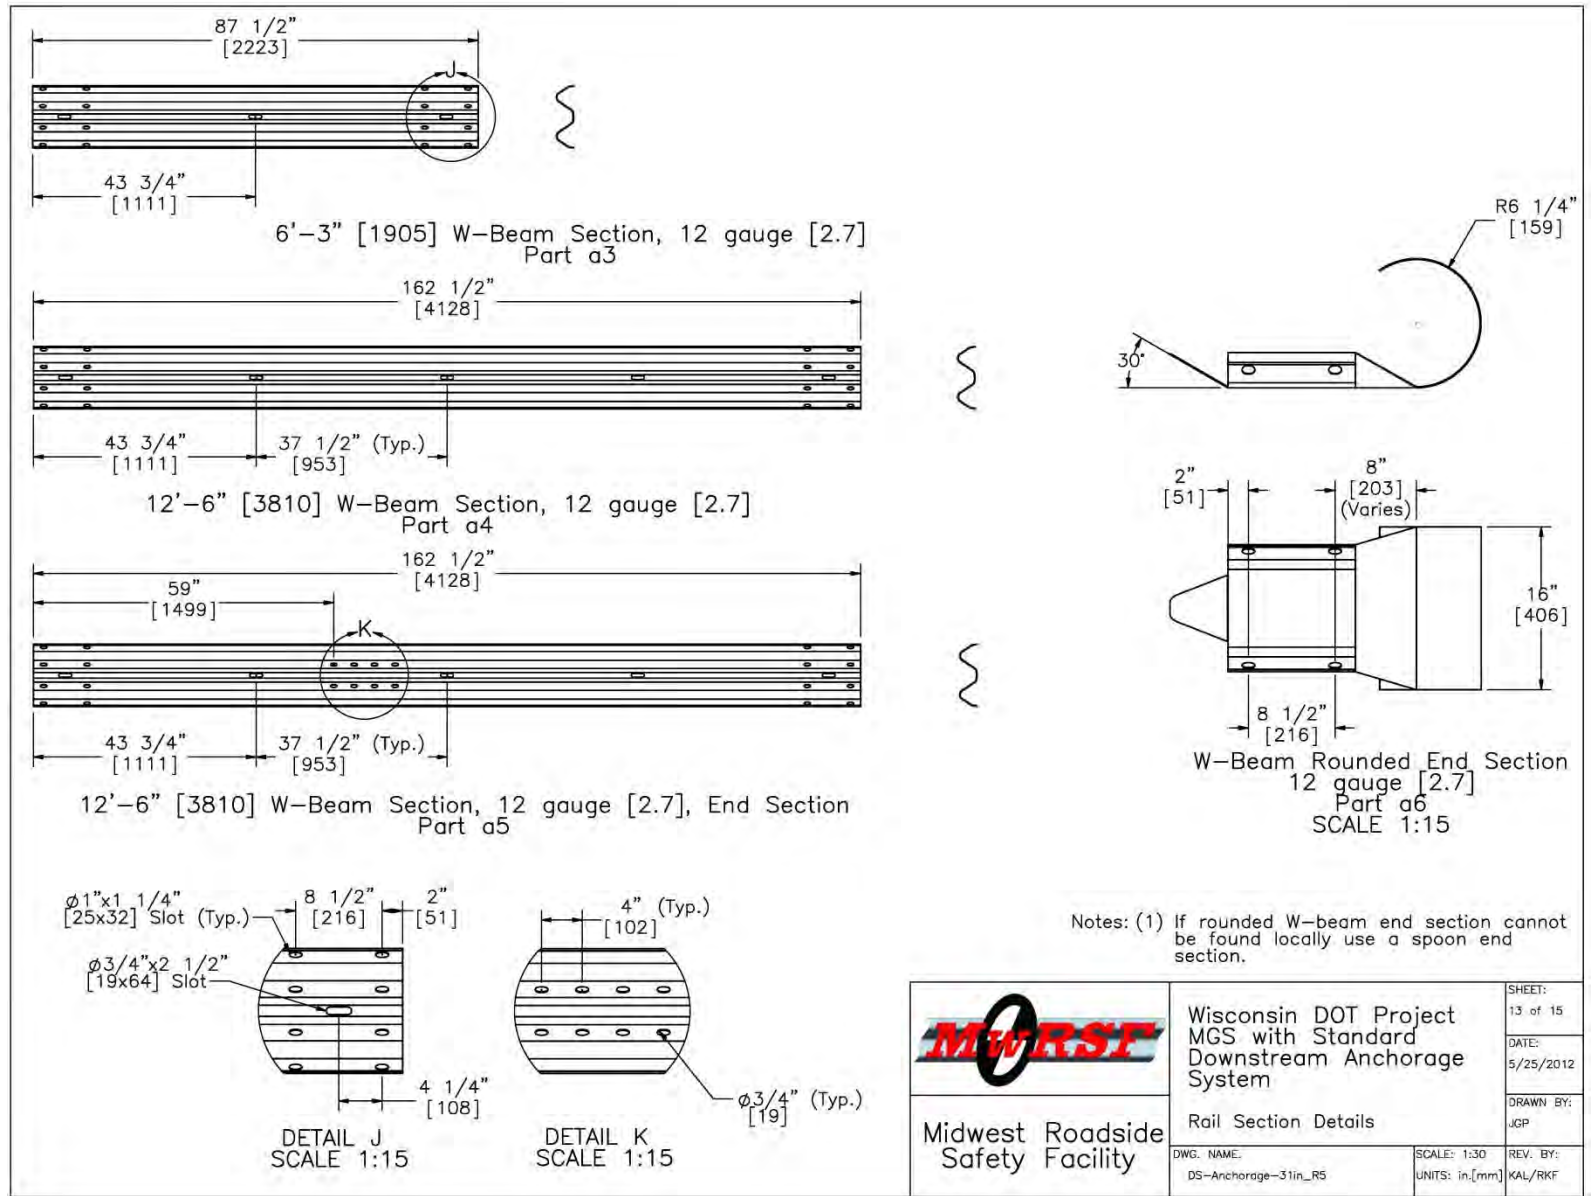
W-Beam Guardrail Details, Test No. WIDA-1
